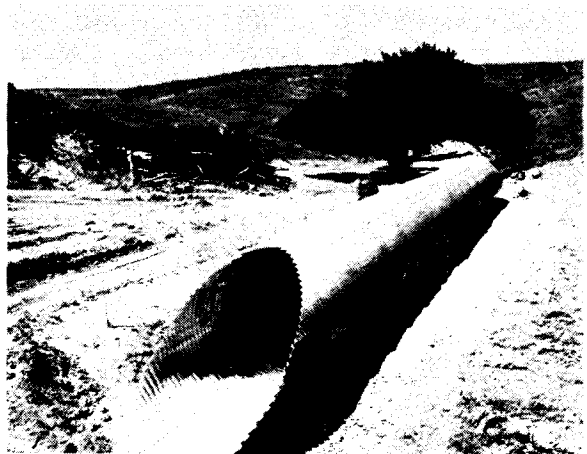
Installation of corrugated-metal-pipe road crossing. P-328-701-8759
